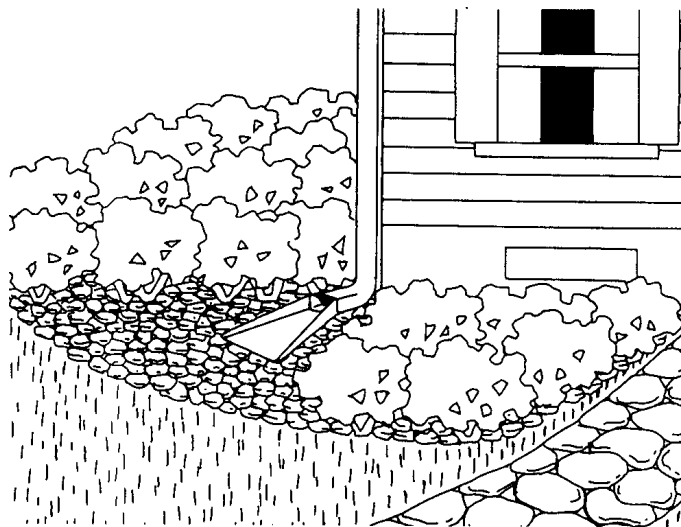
Roof drainage should be directed to the lawn or a flower bed and away from the foundation and paved surfaces.
